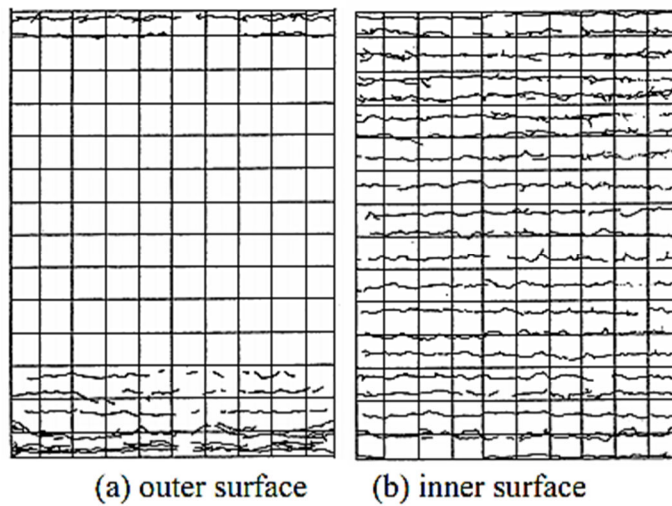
Cracks observed at sidewalls of the two-span RC culvert (Matsui et al., 2004)
